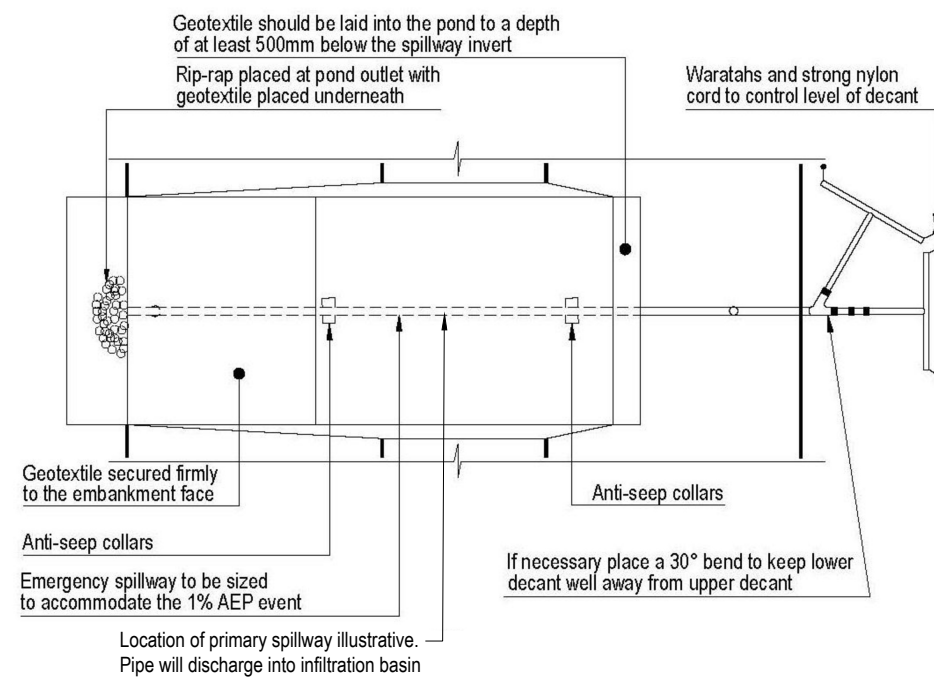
PLAN OF OUTLET FOR 1.5-3ha CATCHMENT
